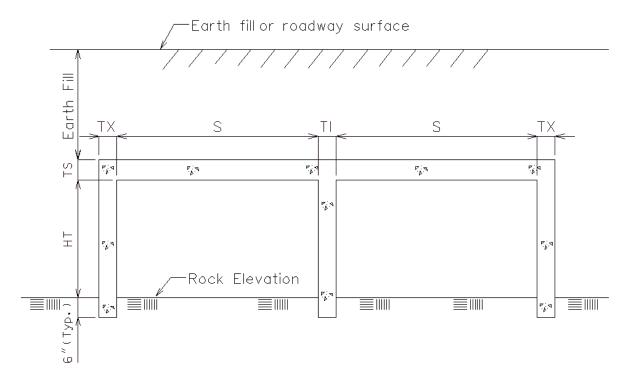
Typical cross section of culvert on a rock foundation
